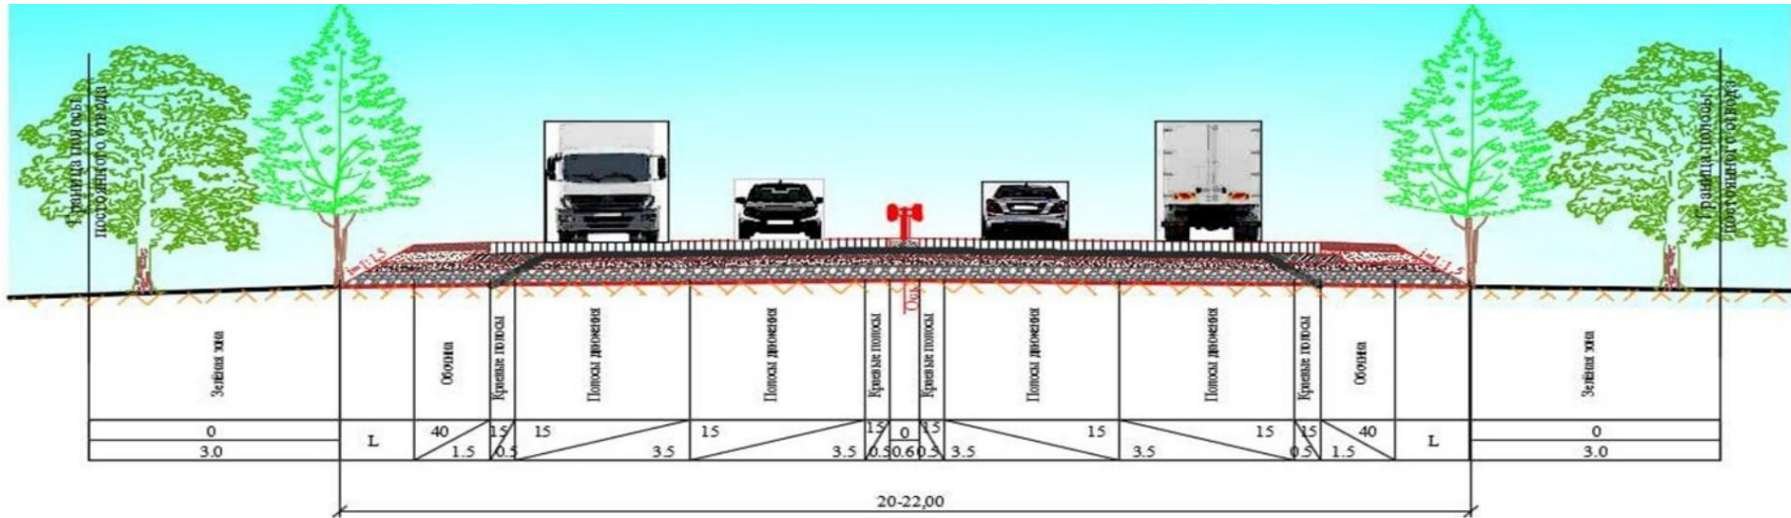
TYPE-2, Option-1 Designed cross-section of the road in settlements
